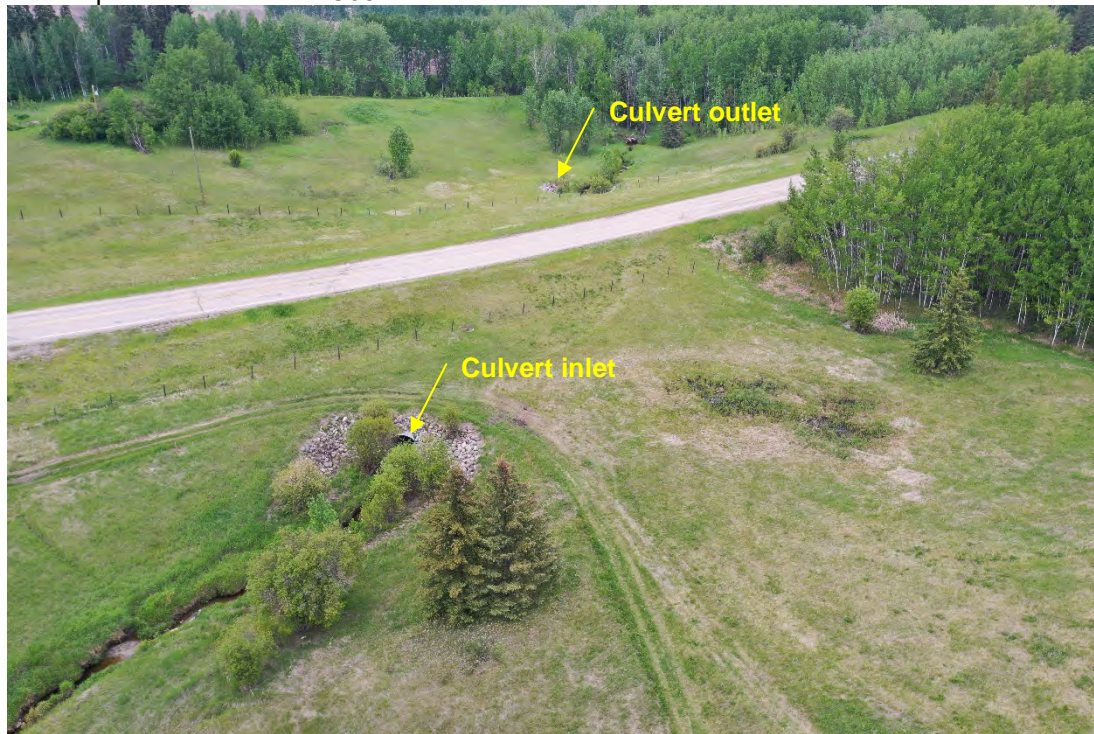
Aerial photo of culvert below Highway 16A, facing northeast. Taken by drone.
